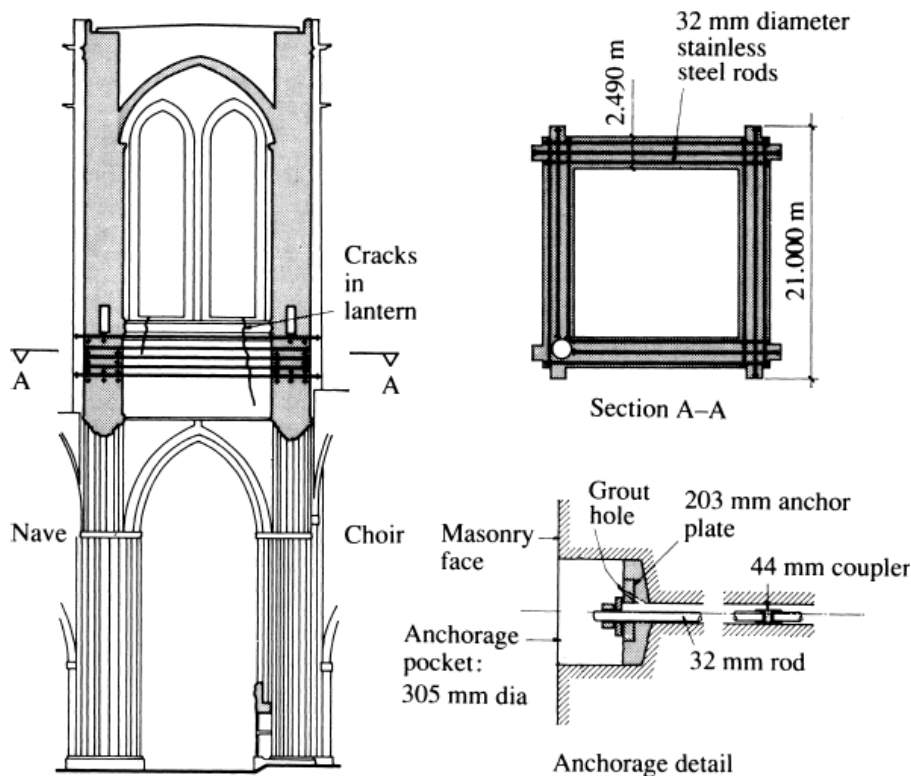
Tensile strengthening of the spandrel walls of the central tower of York Minster (from Dowrick and Beckmann, 1971).
